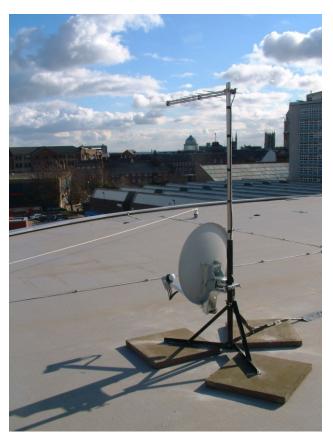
This 65cm dish and log-periodic UHF aerial are fixed onto a steel groundstand. The groundstand is bolted to three concrete slabs and these stand on rubber sheeting to protect the roof membrane.
